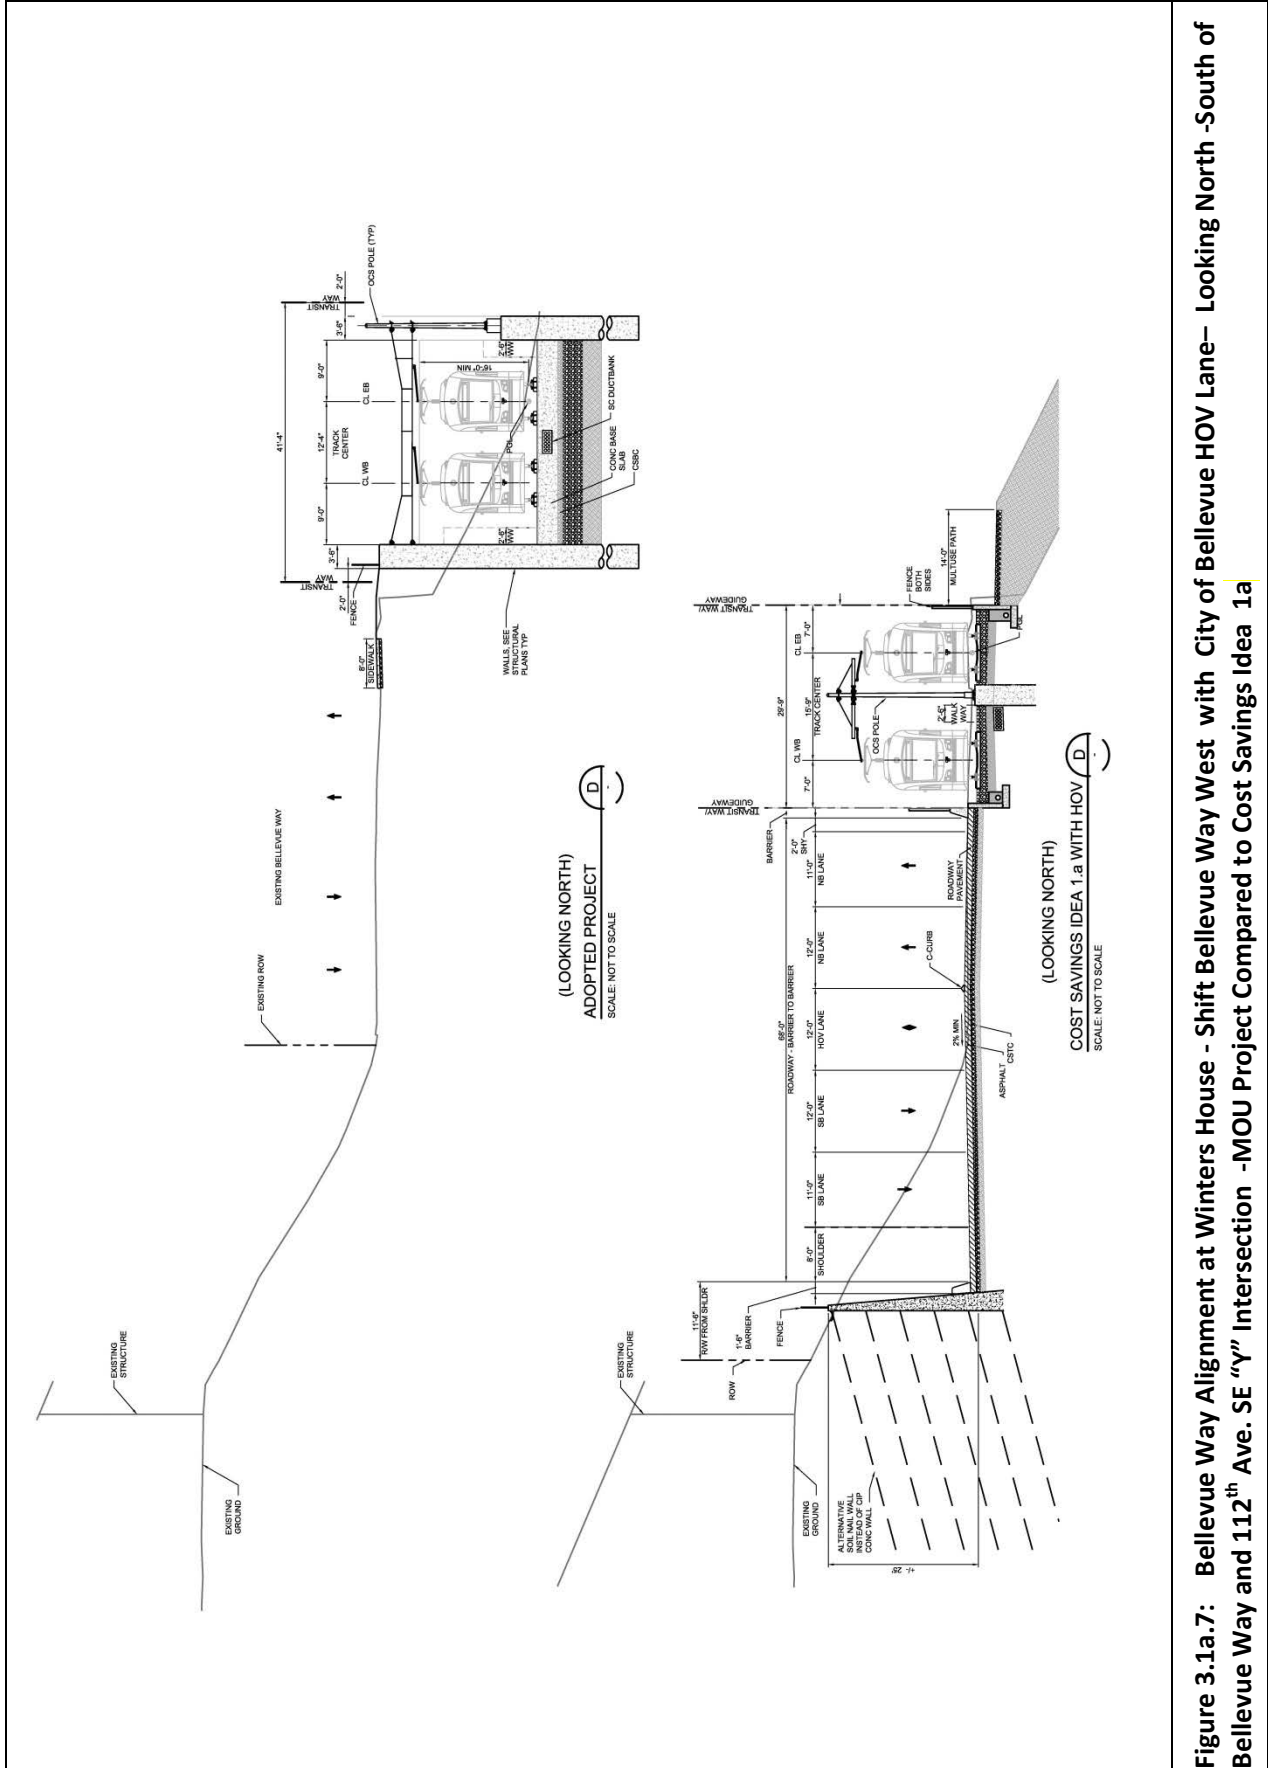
7: Bellevue Way Alignment at Winters House - Shift Bellevue Way West with City of Bellevue HOV Lane— Looking North -South of Bellevue Way and 112th Ave. SE “Y” Intersection -MOU Project Compared to Cost Savings Idea 1a
